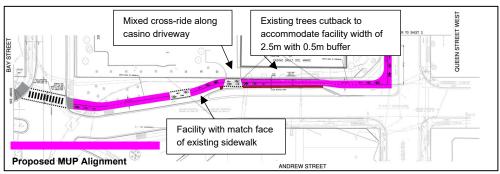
Section of the proposed route alignment's roll plan, between Bay St & Queen St W
